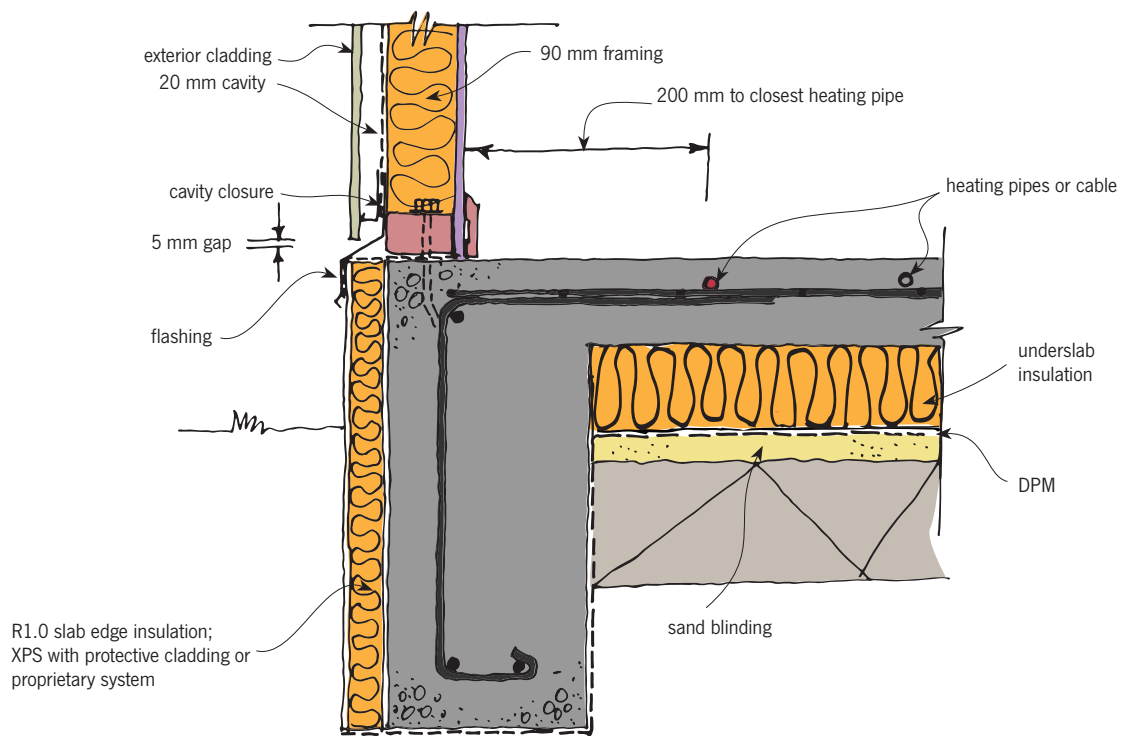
Alternative detail of insulation applied to exterior face of foundation wall with protective plaster or tile finish. Step flashing protects insulation.
